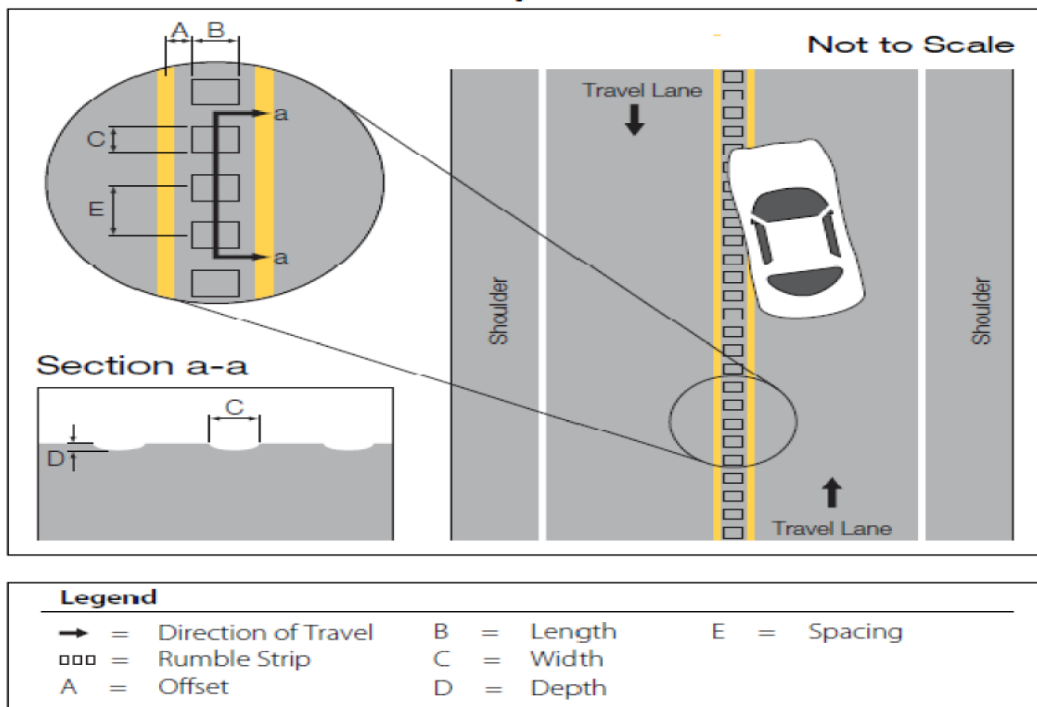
Illustration of rumble strip dimensions (Himes et al., 2017)
